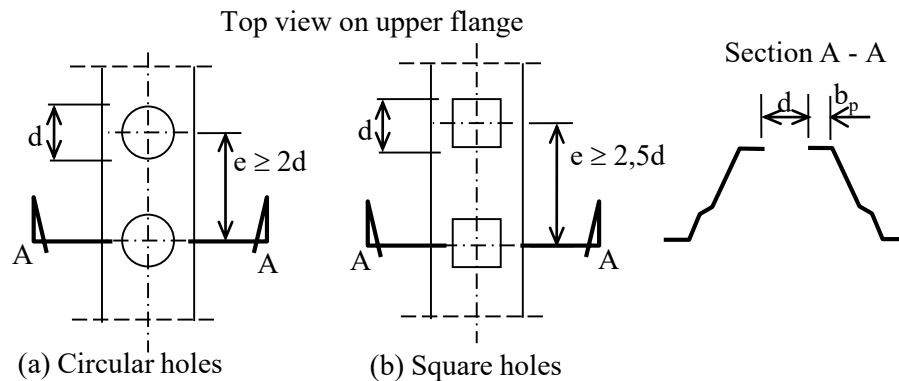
Sheeting with circular (a) or square (b) holes in flange
